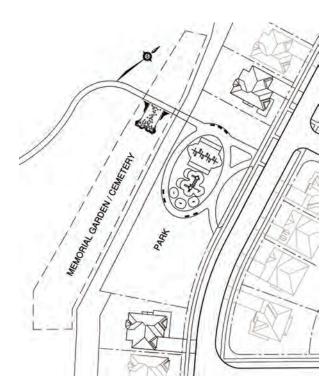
Conceptual Plan of Housing Adjacent to Memorial Garden / Neighbourhood Park
